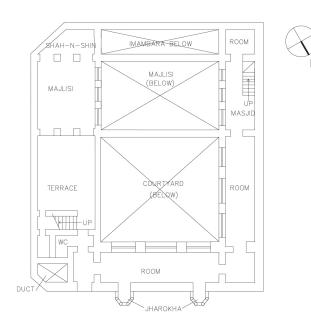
First-floor plan of Rizvi House (Source: the author of the paper)
